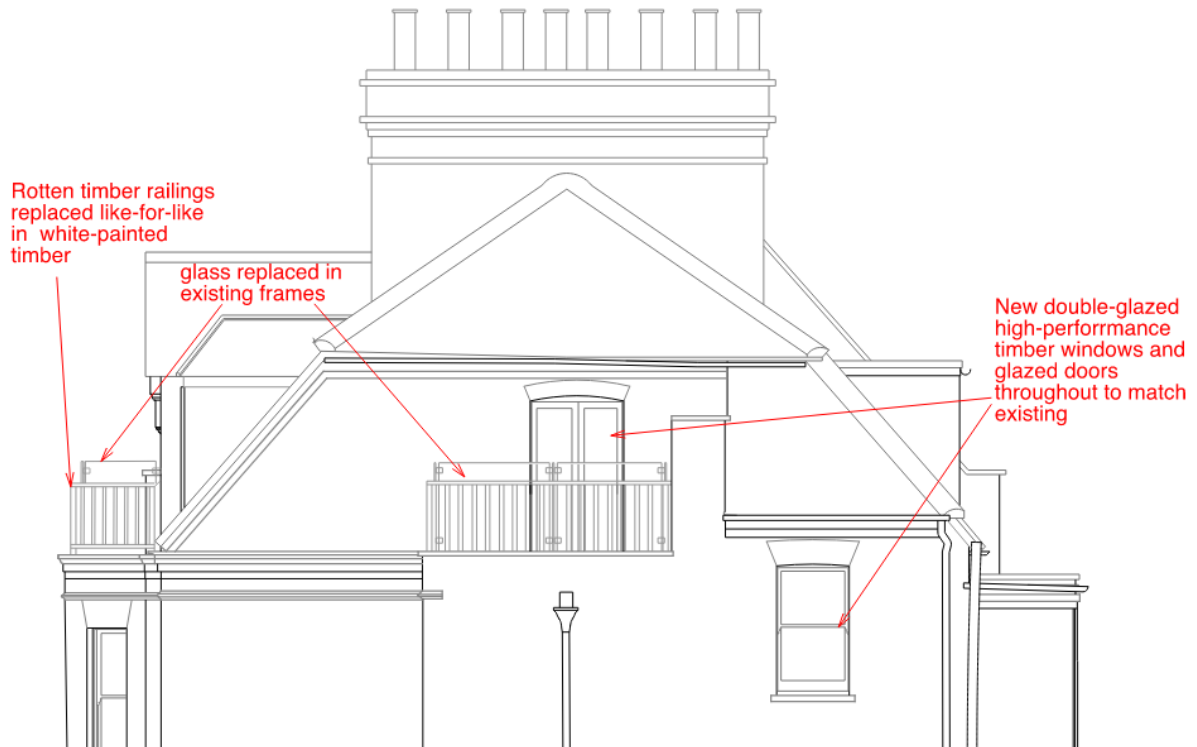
(above): Part of the side elevation (south) showing works to roof terrace balustrades (source: application drawings)
